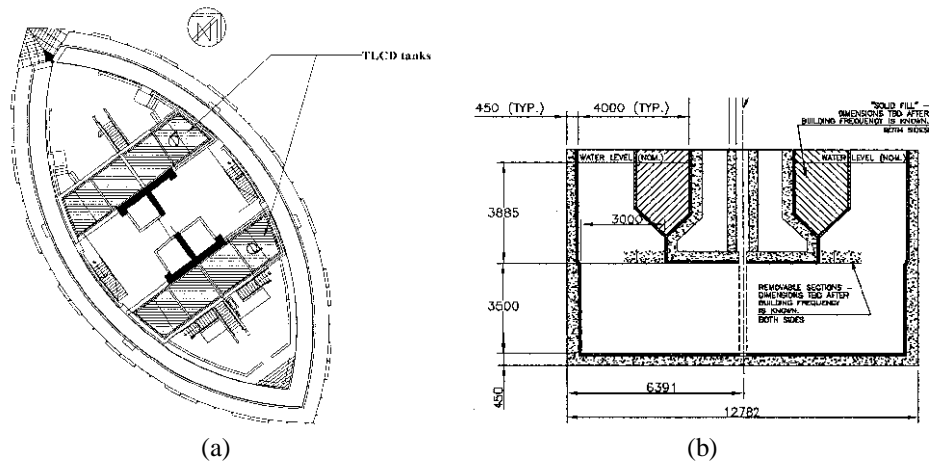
TLCD design for One Wall Centre: (a) top floor plan; (b) cross-section of one of the TLCDs.
